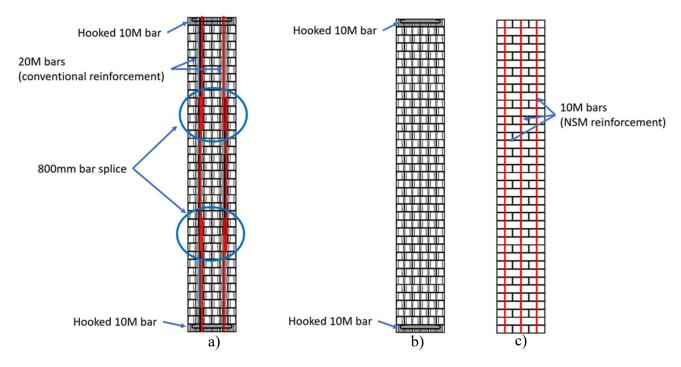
Wall details: a) reinforcement placement in walls S1 and S2; b) grouted reinforcement in walls S3 and S4; and c) NSM reinforcement in the walls S3 and S4
